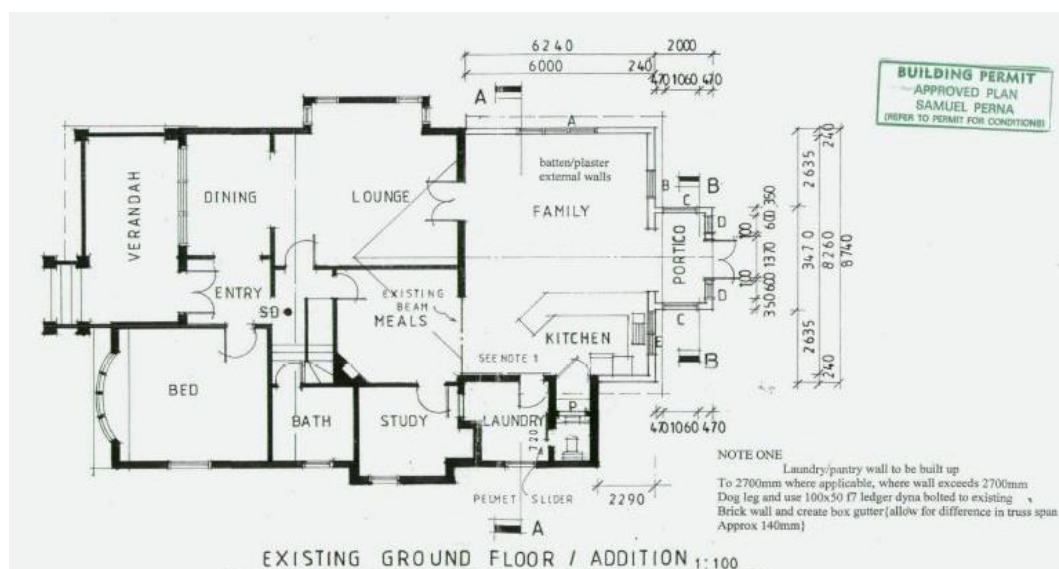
The proposed additions and alterations to the rear of the building. Note the demolition of the pergola and addition of new family, kitchen and rear portico areas. (Source: BP 24990)
